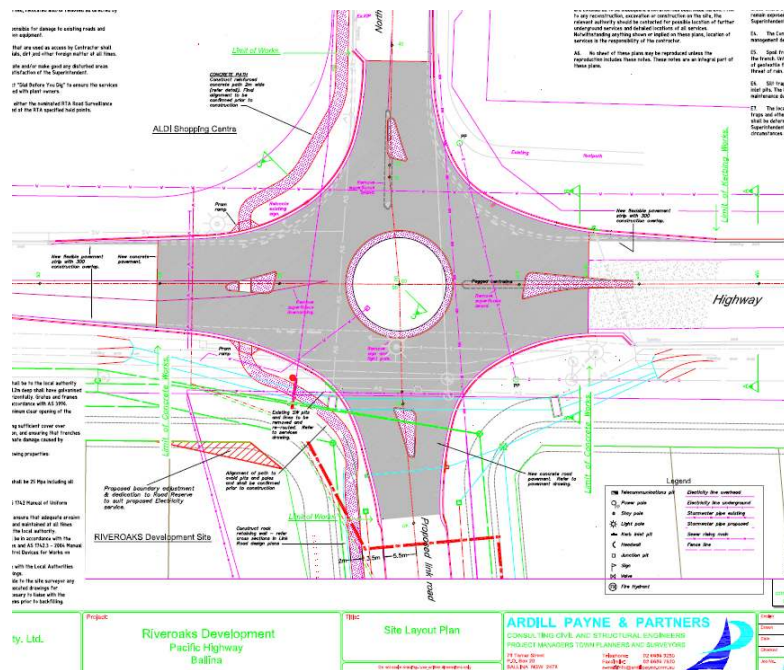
Proposed intersection Pacific Highway/ Link Road (Ardill Payne Partners 2008).
